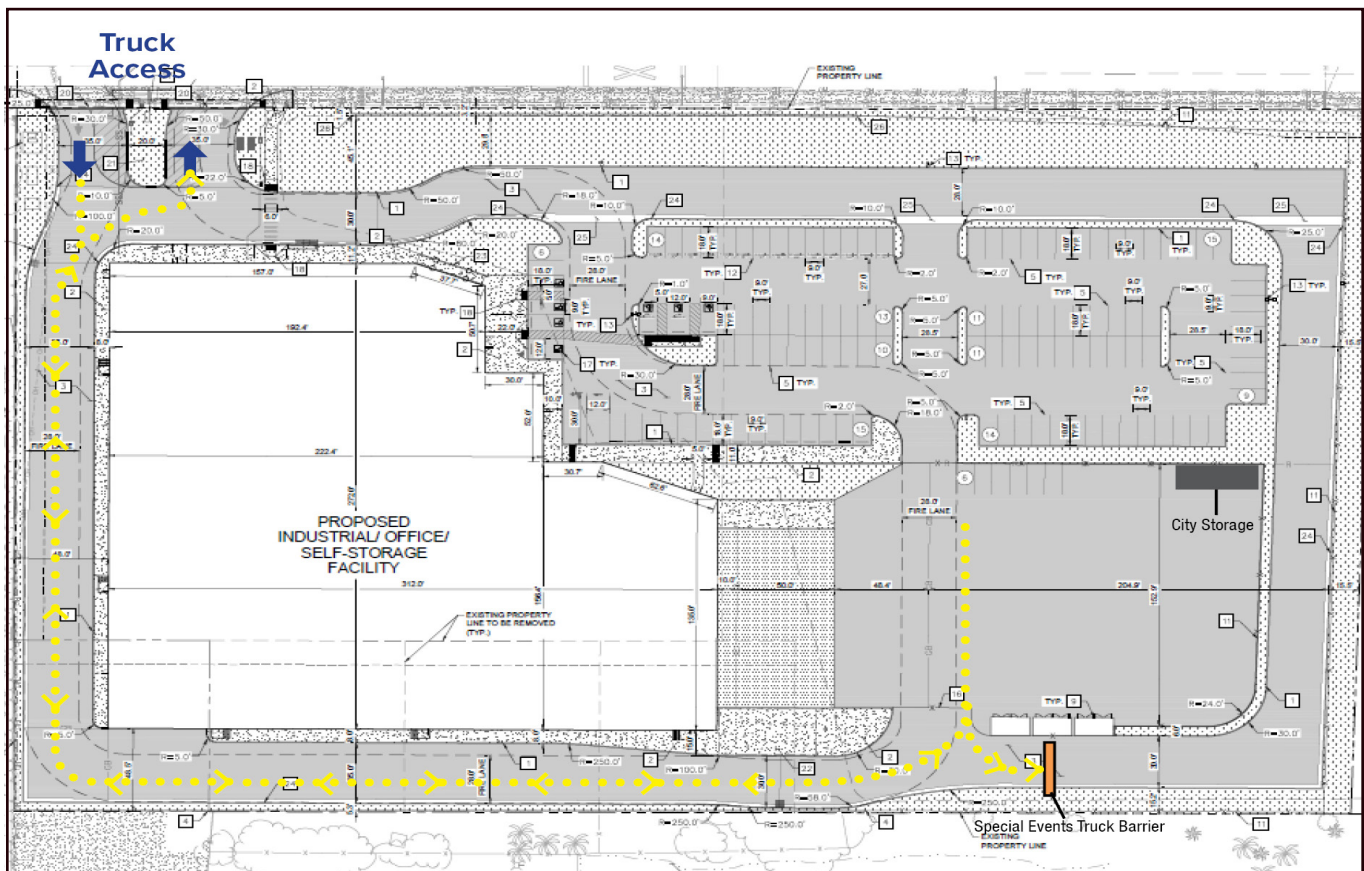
Proposed Circulation Plan - Truck Access Special Events Area
